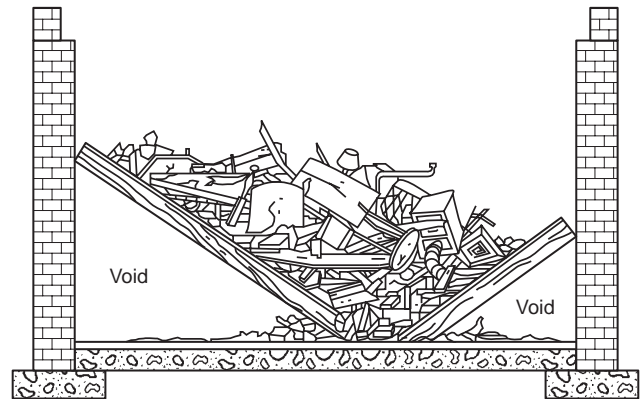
(f)(b) V-shape floor collapse. (Courtesy of U.S. Department of Civil Defense)
